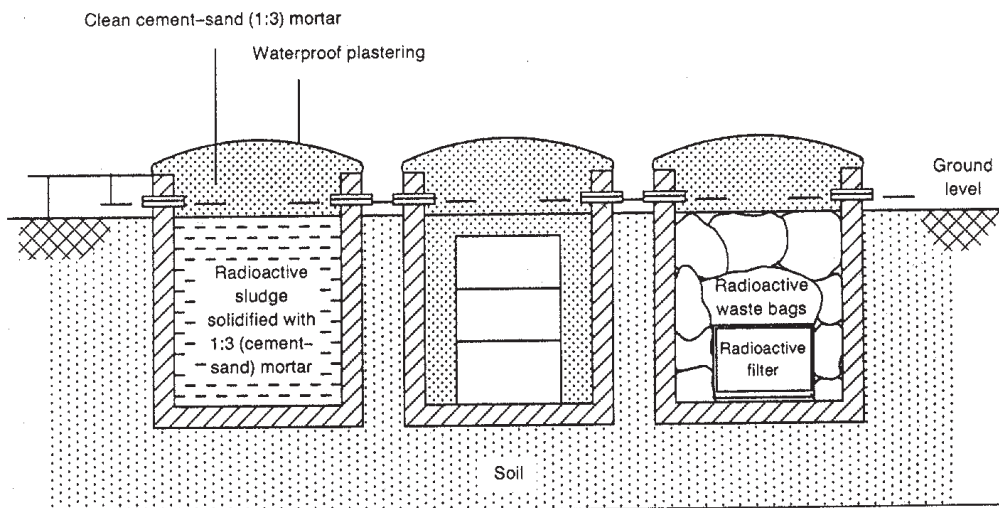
Cross-section of spun concrete receptacles in unlined earth trenches, Tarapur, India.
